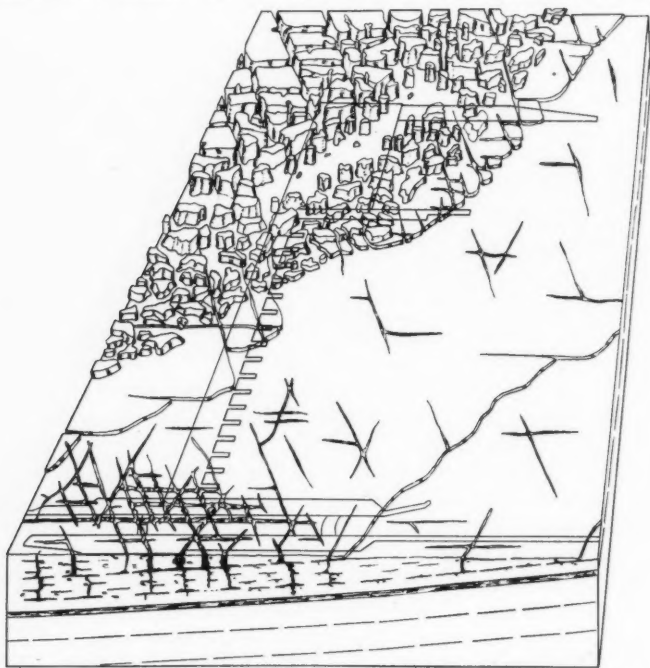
BLOCK DIAGRAM OF THE ORIGINAL ROCK FOUNDATION AT GUNTERSVILLE DAM SITE ($V E = 4$)
